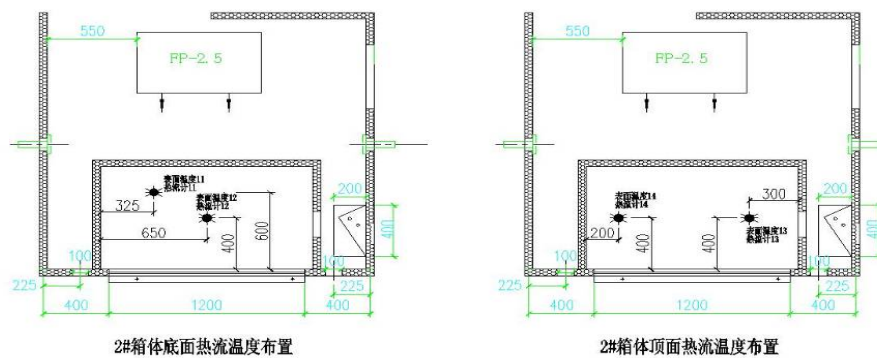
Arrangement plan of heat-flow measuring points for No.2 testing box
